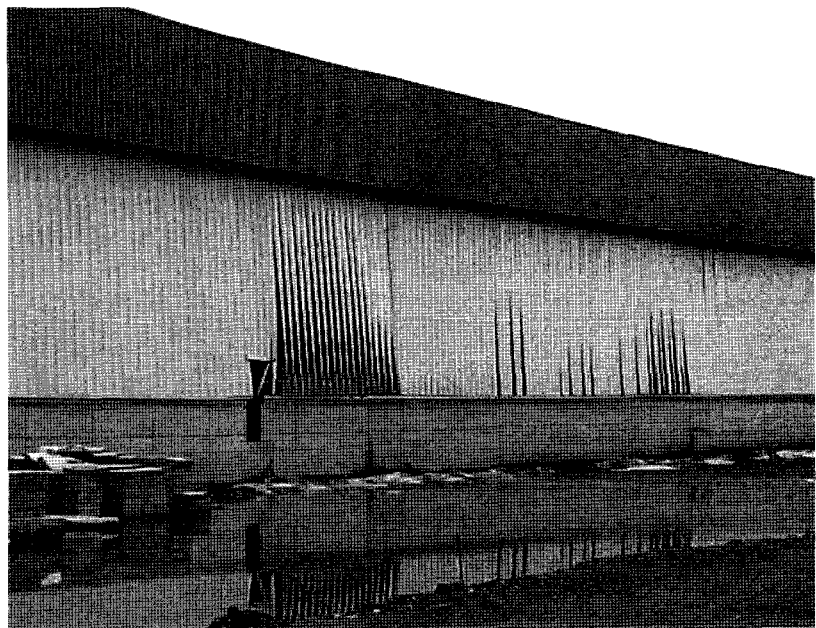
Wall of Ford-Otosan assembly plant building showing distress caused by secondary faulting beneath the building. Building consists of multi-column truss structure on a concrete slab. Secondary displacement of 30 to 40 cm significantly damaged the building.
